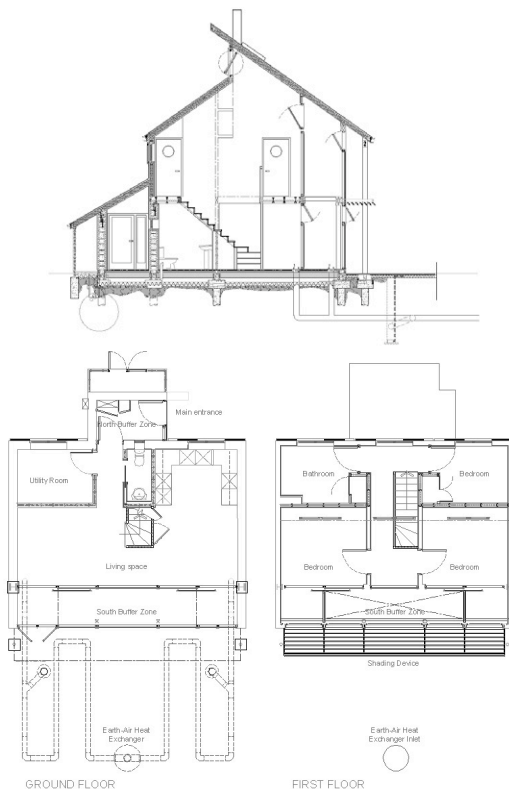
The BASF house's layout (source: Derek Trowell Architects)
